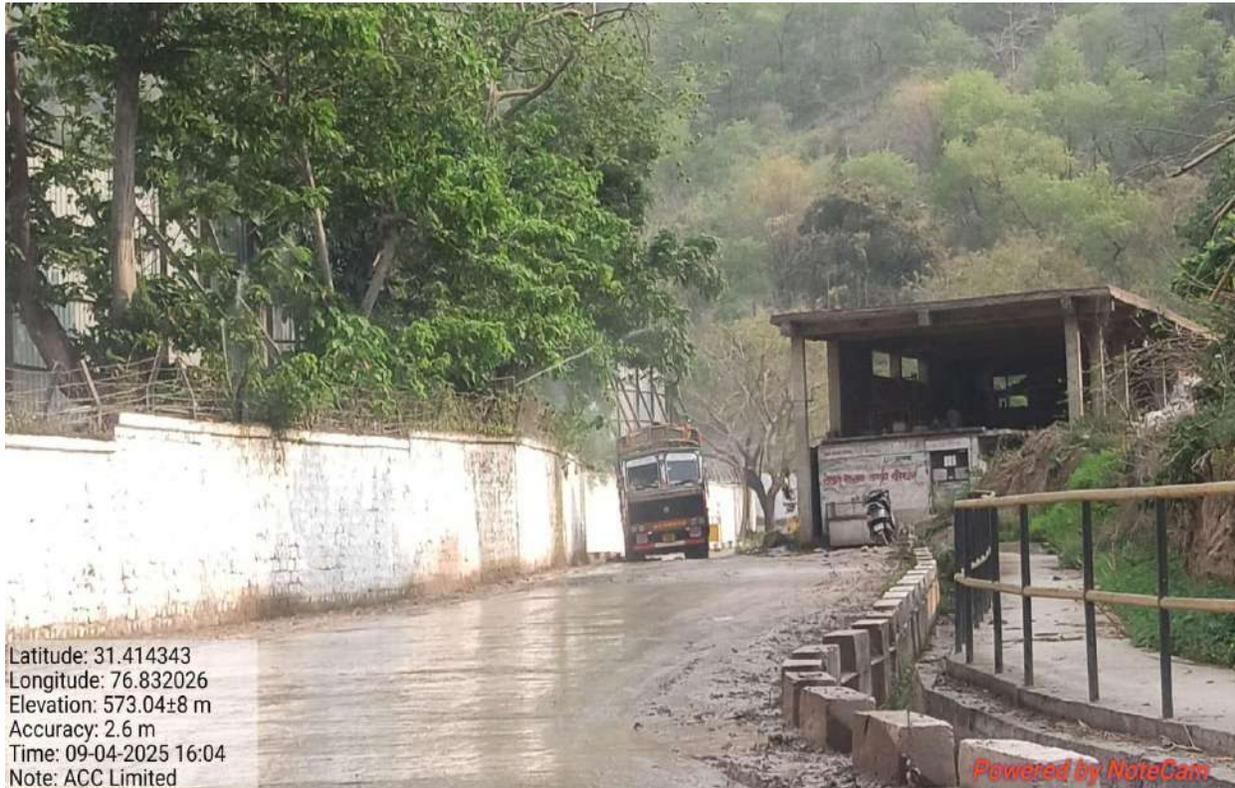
Approx. 9 meters high extension of MS Sheet towards Sh. Kashmir Singh Poultry Farm and around the boundary of packing section and total 130 meters length wise sheets has been installed
